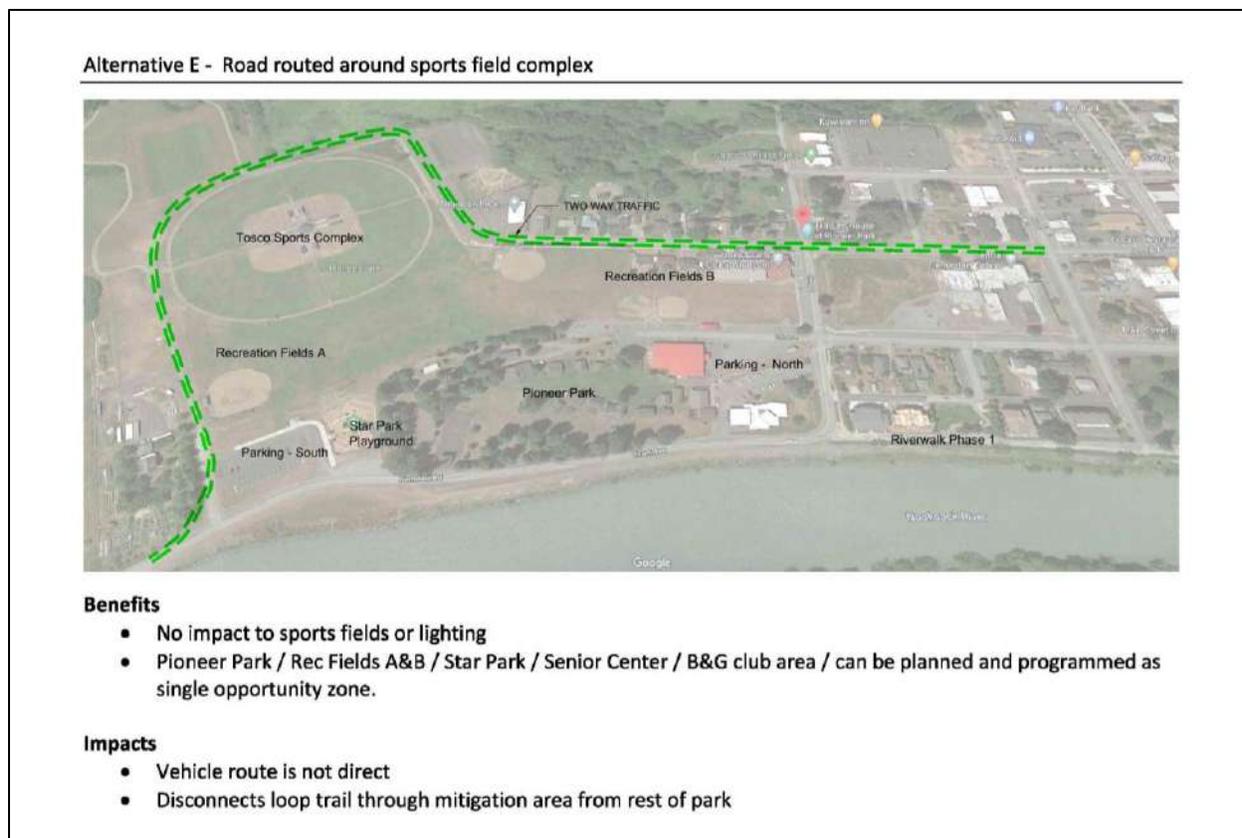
Alternative E of road realignment off 2nd Avenue and around the sports complex.
